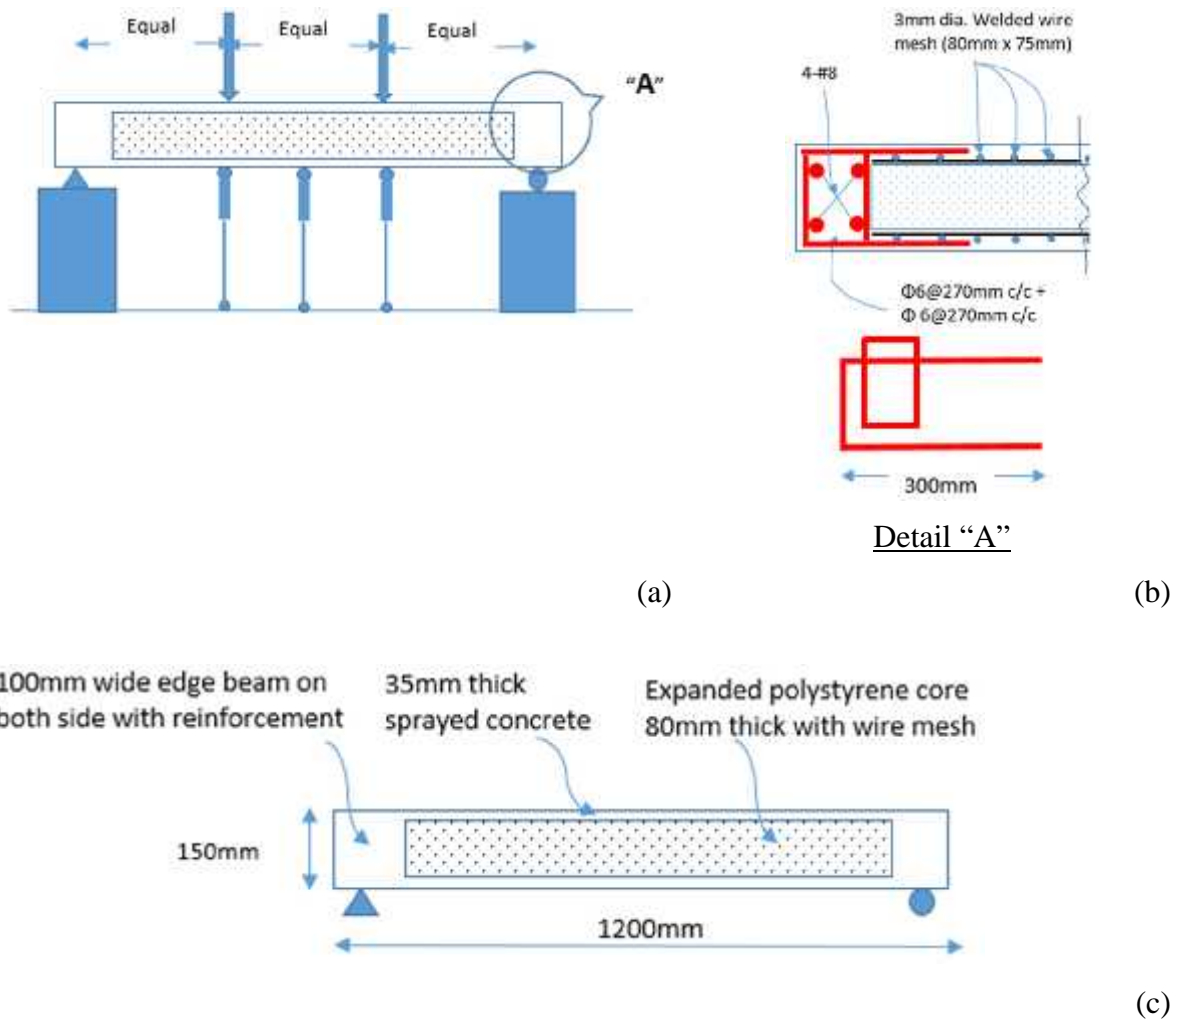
Schematic diagram of flexural test: (a) Test setup; (b) Reinforcement details of specimen; and (c) Cross section of specimen
